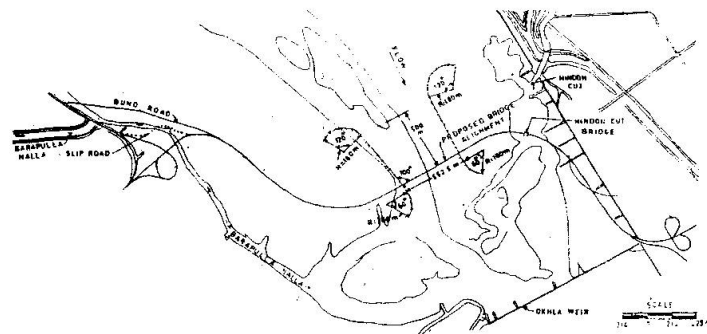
DELHI NOIDA BRIDGE SITE PLAN
